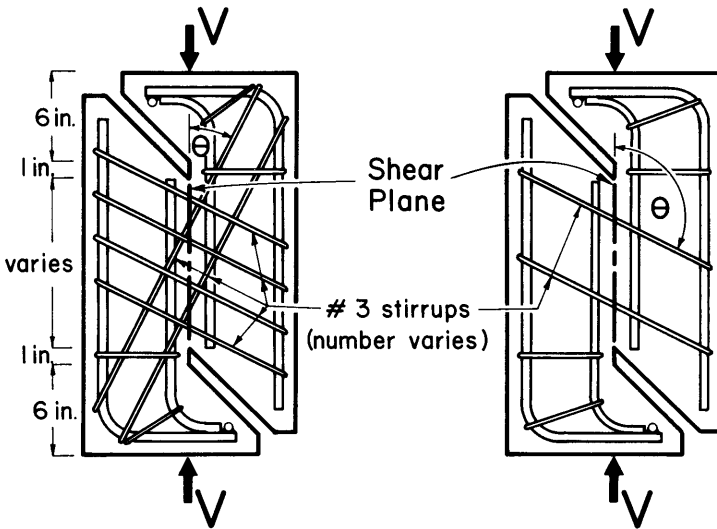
Typical push-off specimens with orthogonal and parallel reinforcement
